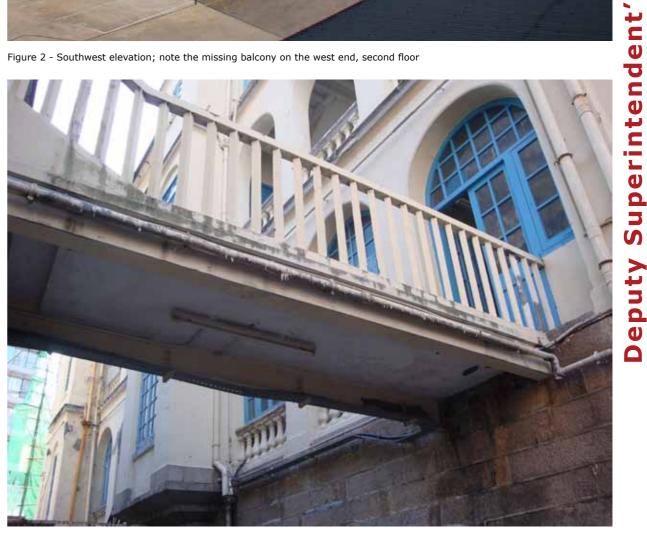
Link bridge between the north side of Building 04 and the south side of Building 06
